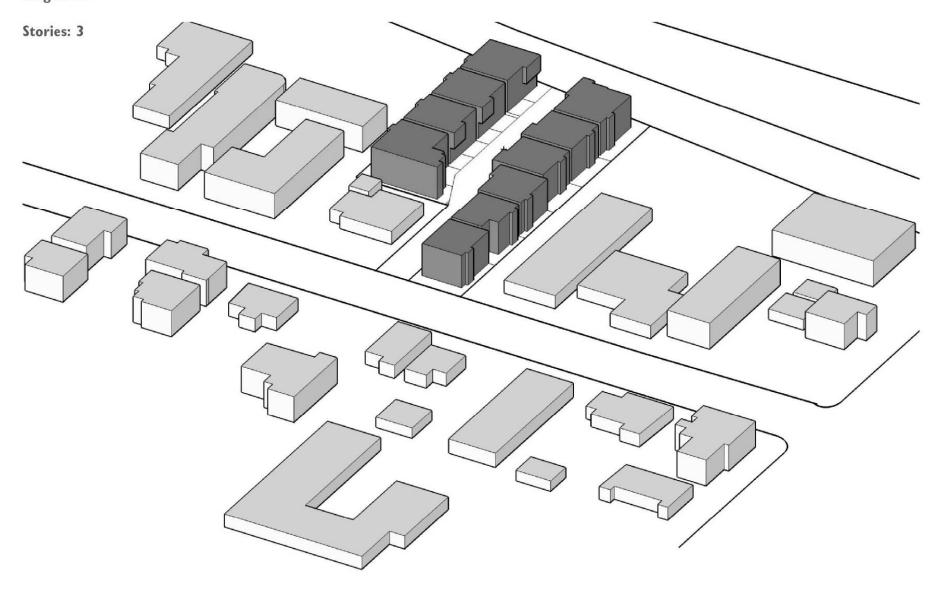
16100 MAUBERT AVENUE AND SURROUNDING CONTEXT
